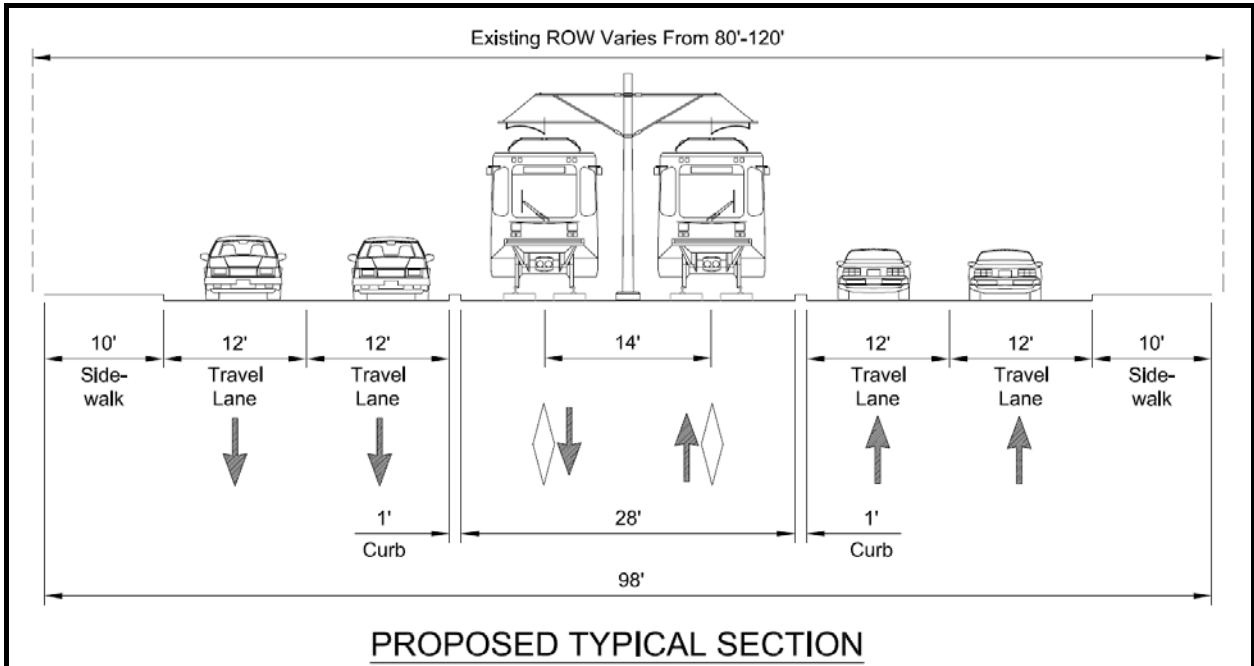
LIGHT RAIL TYPICAL STREET PROFILE B
